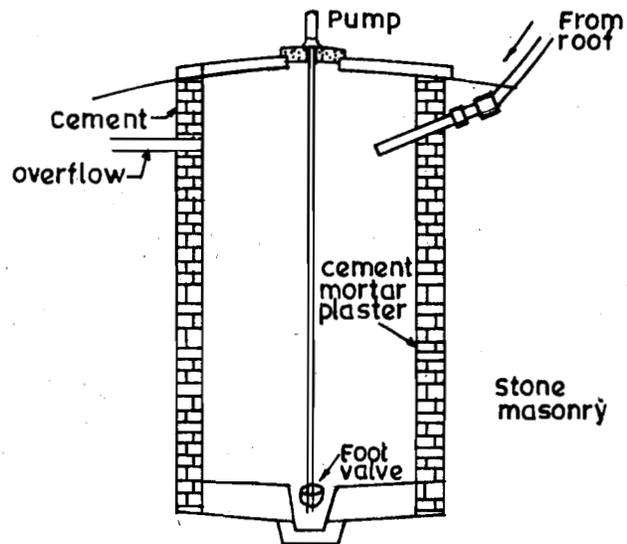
(a) : An Underground Cistern Walls Made of Bricks
